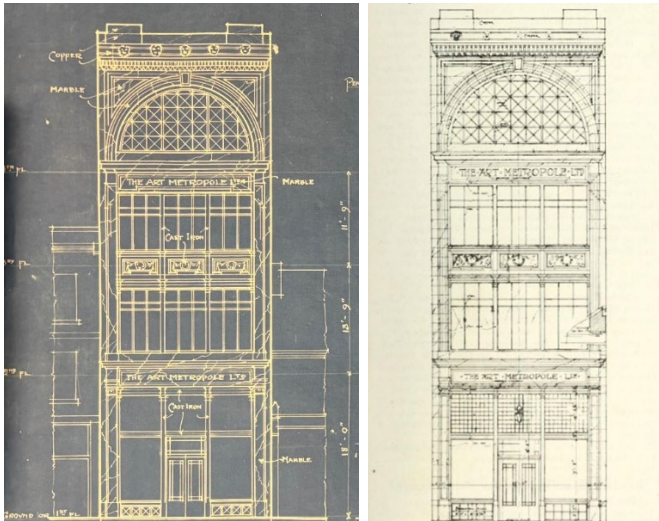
At left: original elevation of 241 Yonge Street's west façade as drawn by the architects Mitchell & White, dated June 1911 (CTA). At right: elevation drawing of 241 Yonge Street that appeared in the *Contract Record* Vol 25 No. 30 (26 July 1911), 53.
